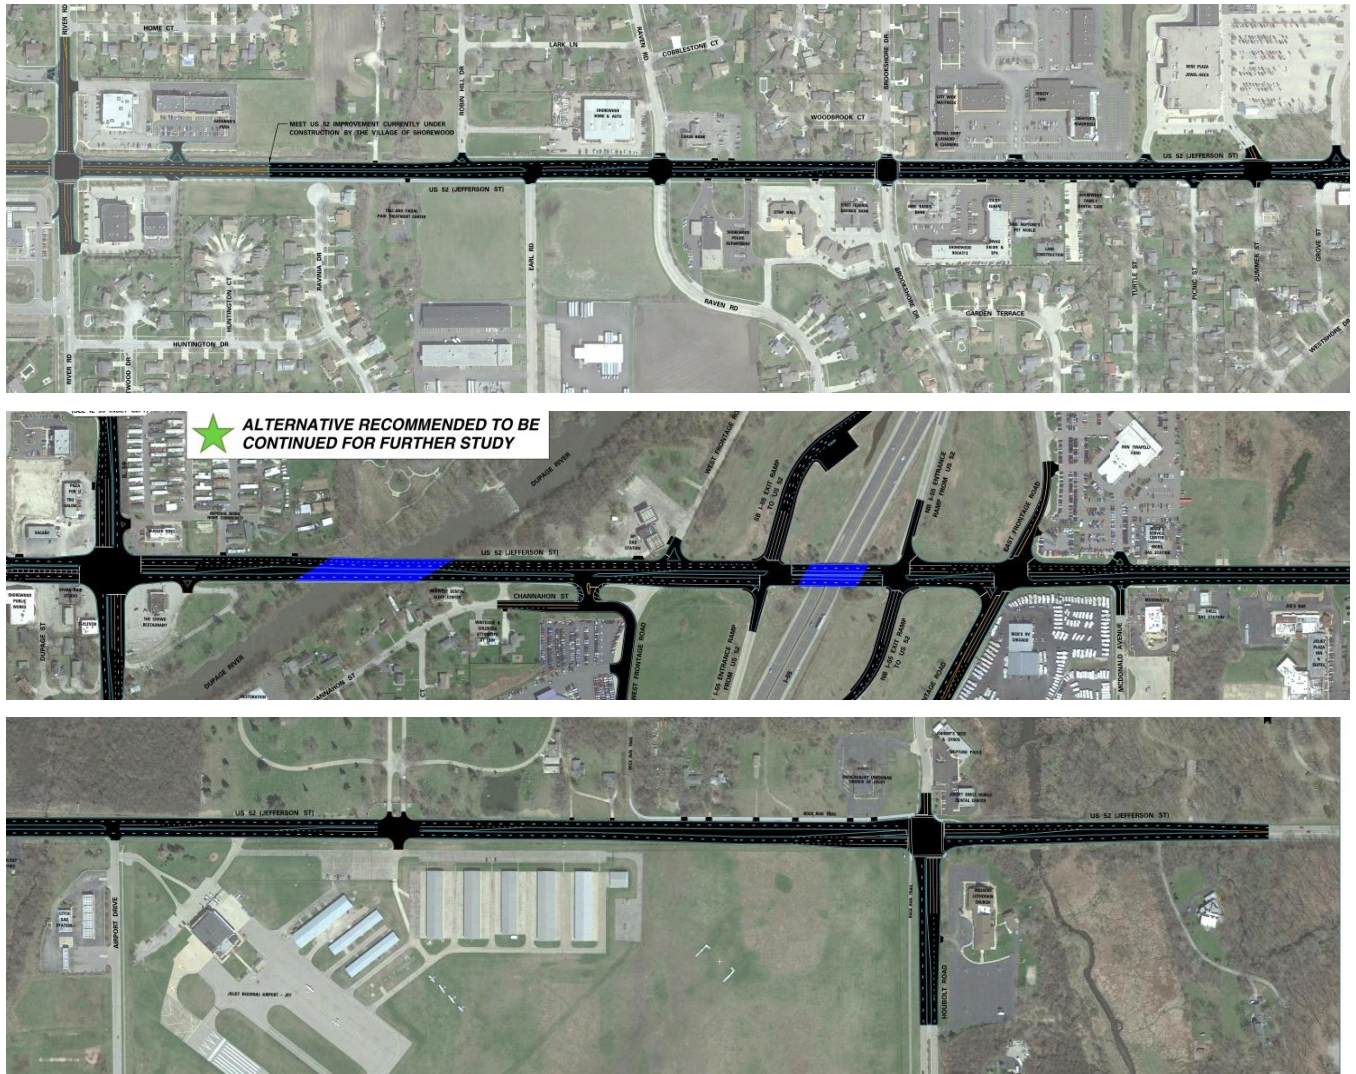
US 52 Alternative River Road to Houbolt Road Concept Plan
